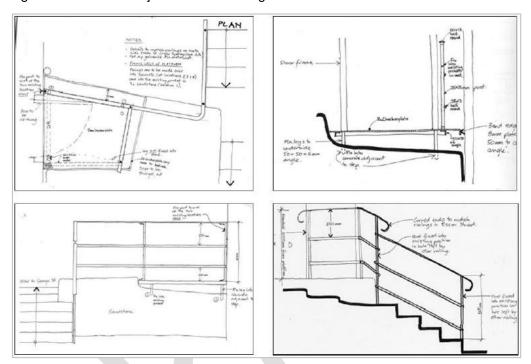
Sketch plans of the proposed platform on the stone landing on the southern façade of the original, 1860s wing, prepared by SHFA for the Sailors' Thai Restaurant entry. (Source: SHFA File No. RE 1352.01.01)
